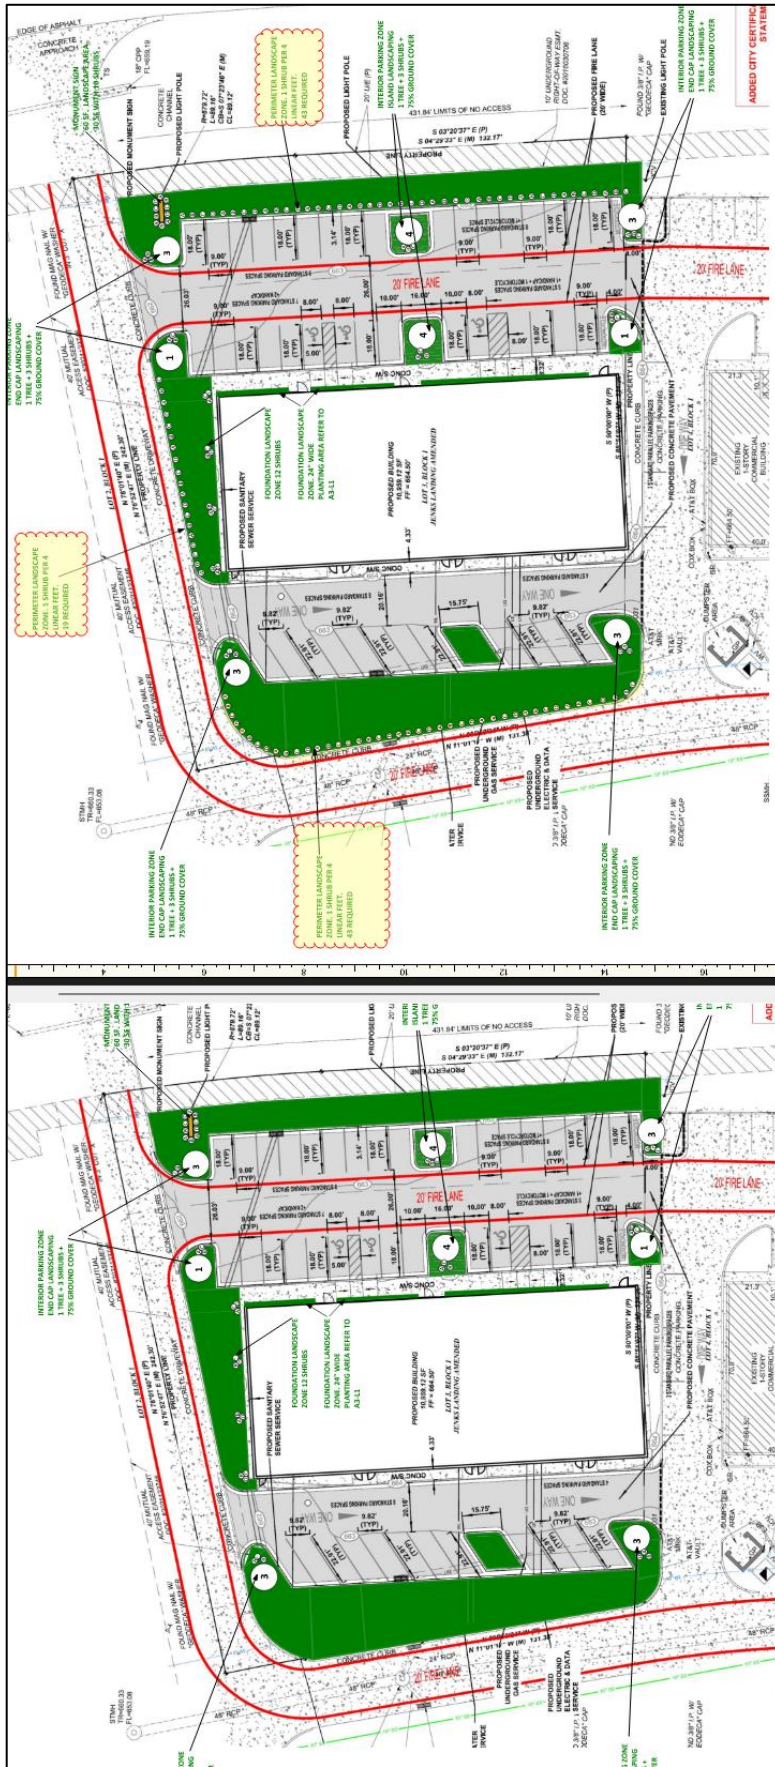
Landscape plan as approved by staff, Landscape plan as requested by applicant.
